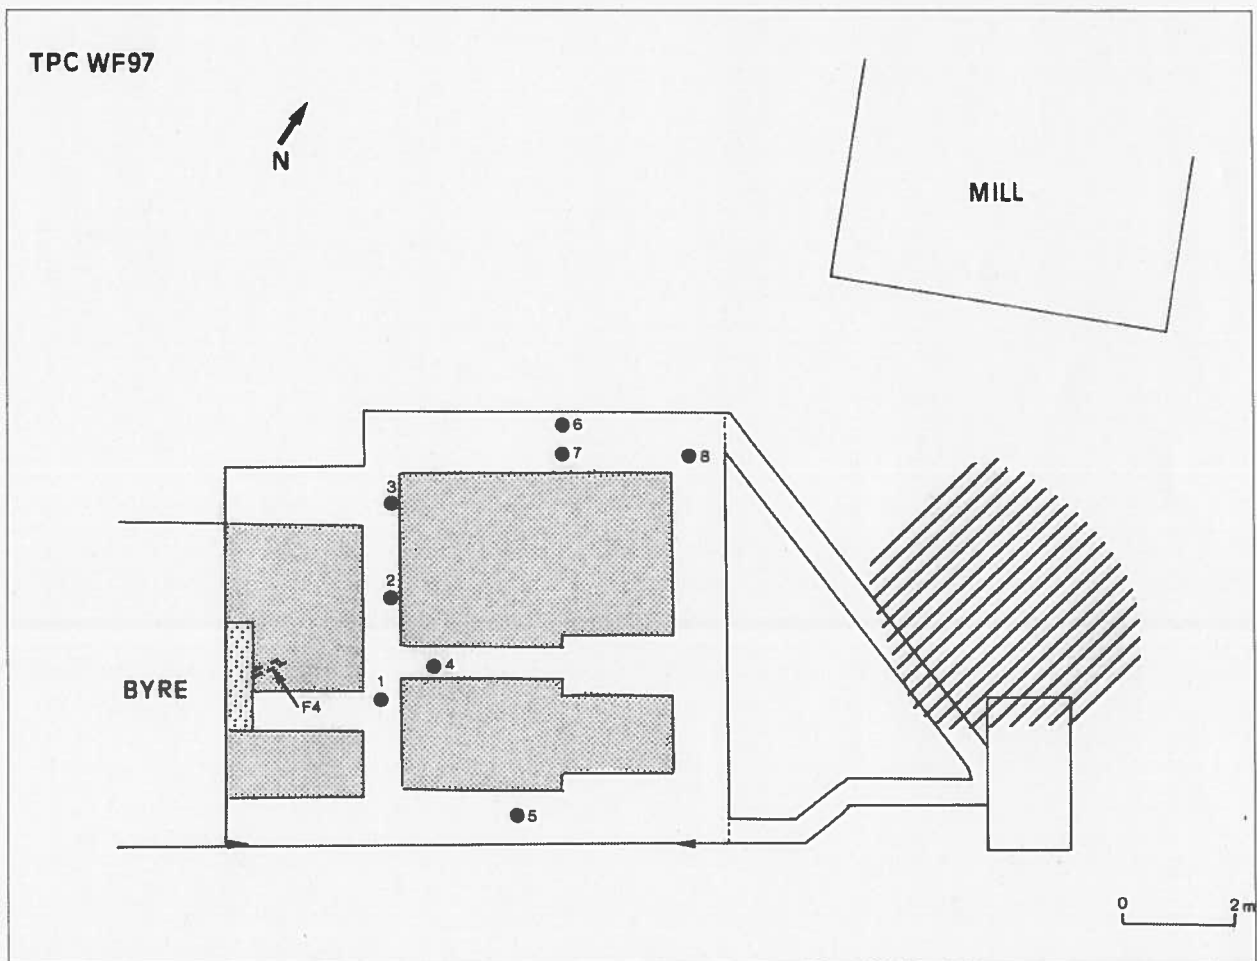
Woolcombe farmhouse (1997) plan of new foundations on bottling plant site. Numbered dots 1 to 8 are the locations of the remains of hardwood posts within the new foundation trenches. F4 is a Type 3 field drain. The shaded zone to the right is the site of a former cess pit (Hewitt 1997b, 20).
